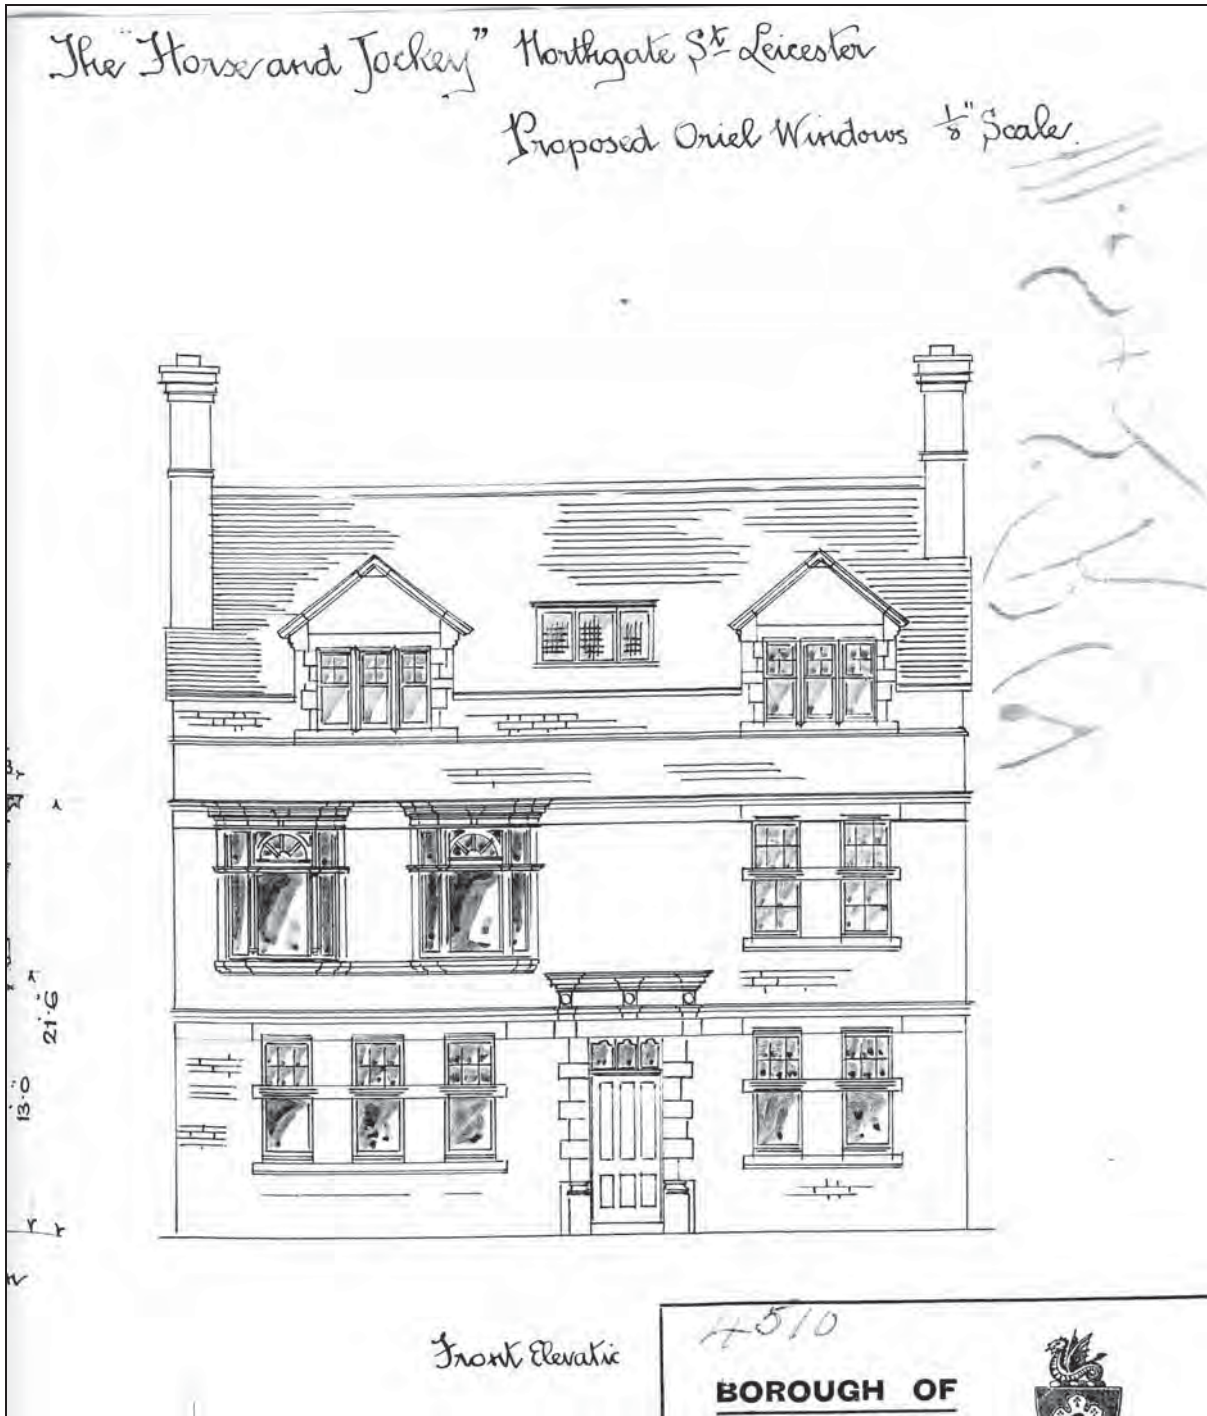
LBR Plan 4510 of 1897. No. 10 Northgate Street, principal elevation, not shown to scale.
